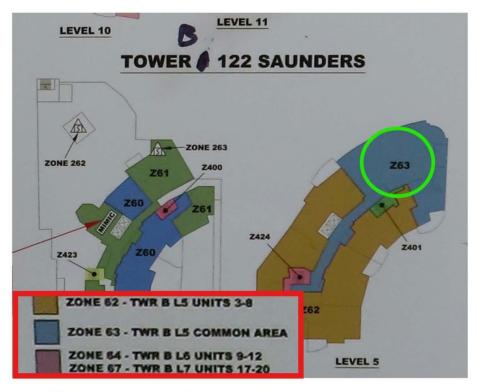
FIP block plan changed to reflect inaccurate zone addressing
